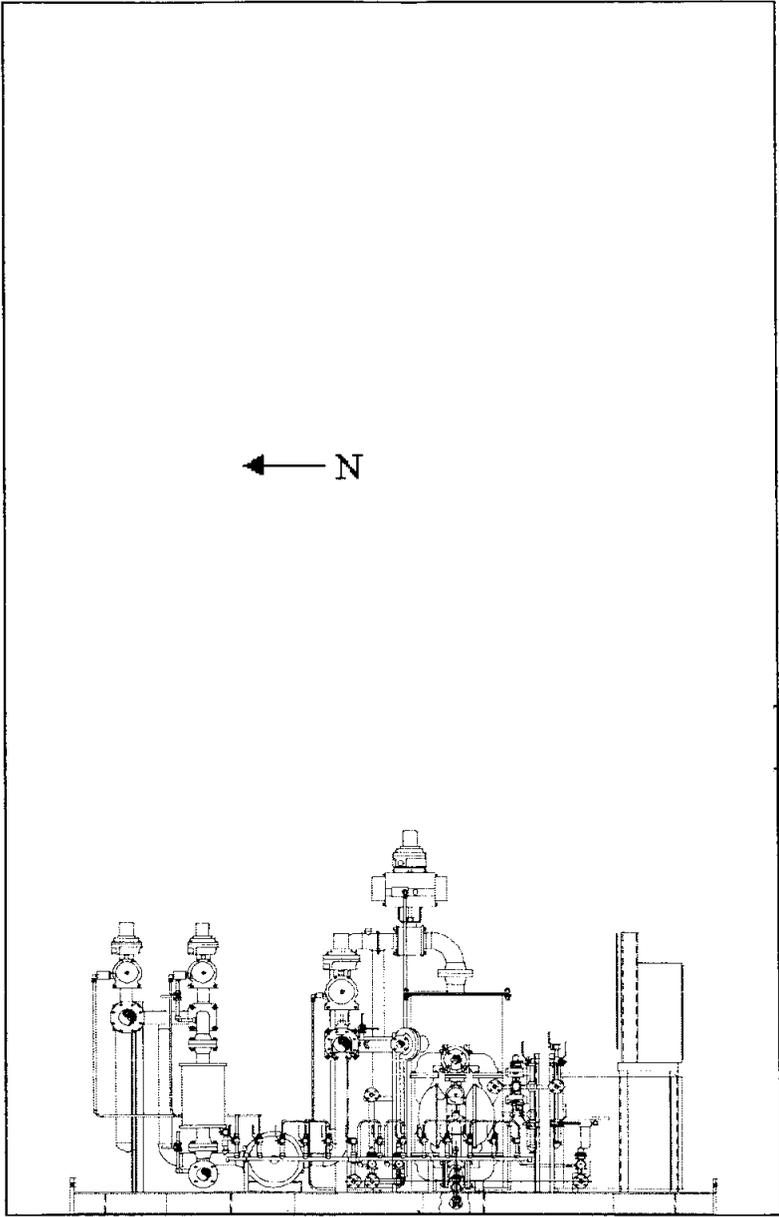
Dewatering Equipment Skid Side View Located in Room P-0119
